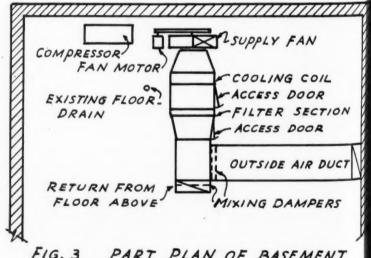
PART PLAN OF BASEMENT SHOWING EQUIPMENT LAYOUT.
